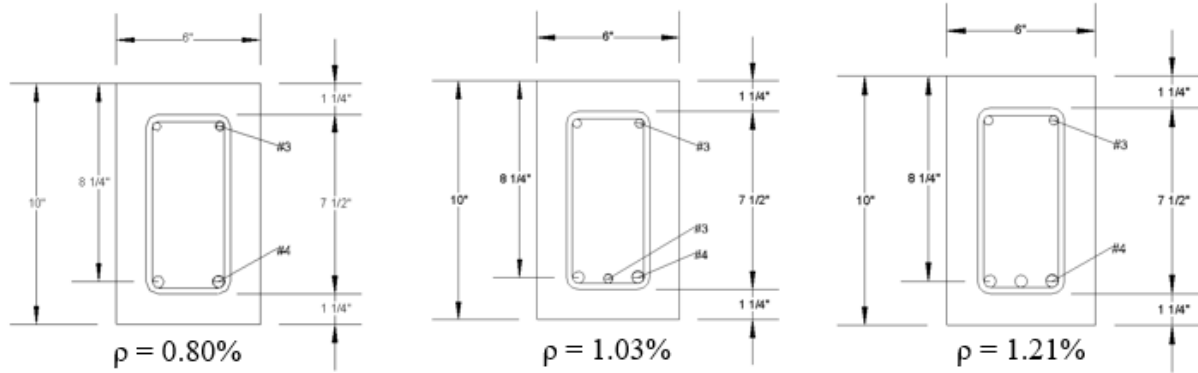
Cross Sections of Laboratory-Scale Beam Specimens
